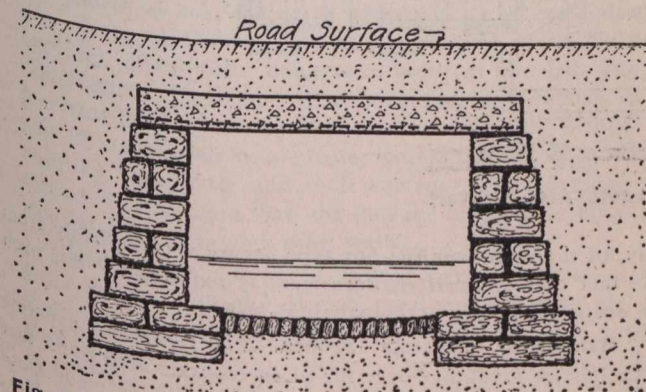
Reinforced Concrete Slab on Masonry Abutments.
